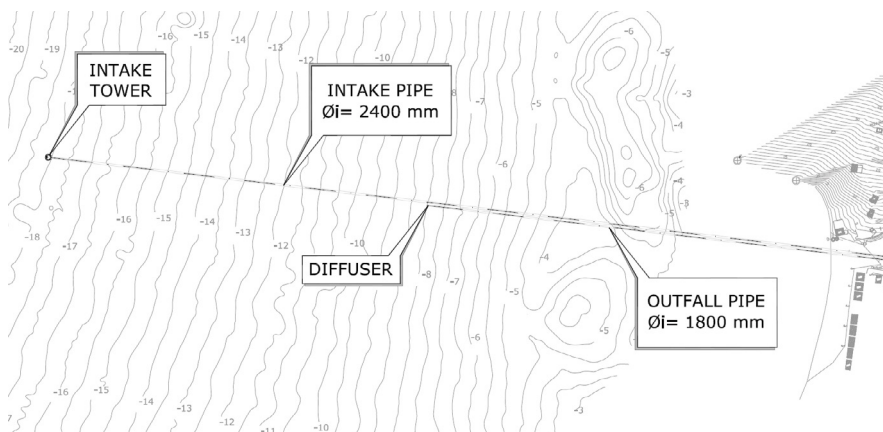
Layout of Beni Saf desalination plant (Algeria – 2007) where the intake tower is deeper than the diffuser stretch.
